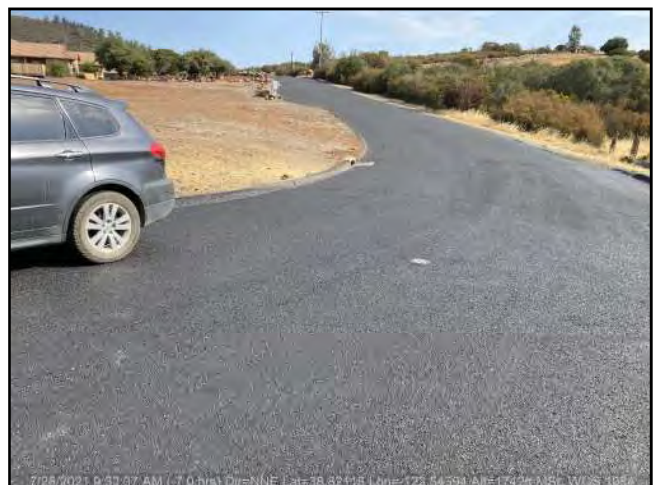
Intersection of Tinilyn Rd & Jacklyn Dr Looking West up Tinilyn.
